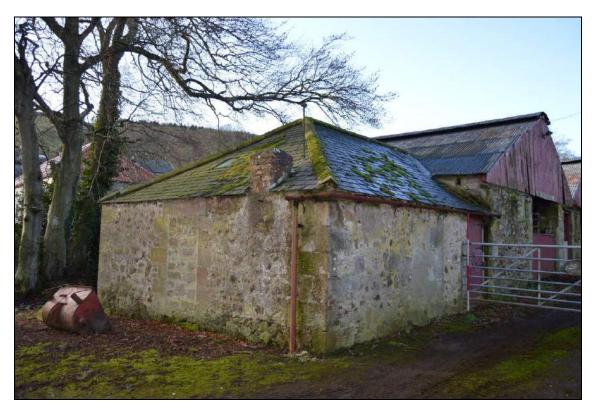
Projecting wing of south animal shed (facing south west). Scale 2m.
